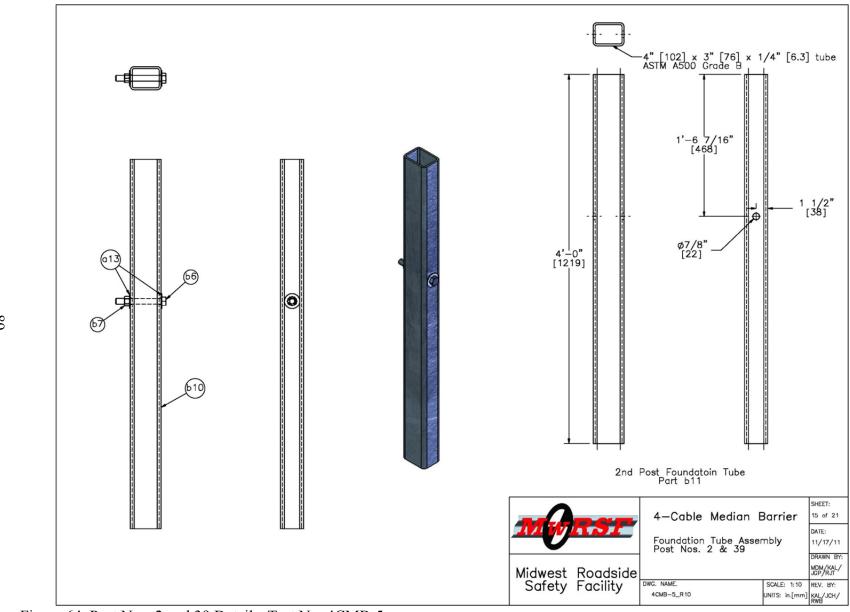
Post Nos. 2 and 39 Details, Test No. 4CMB-5
